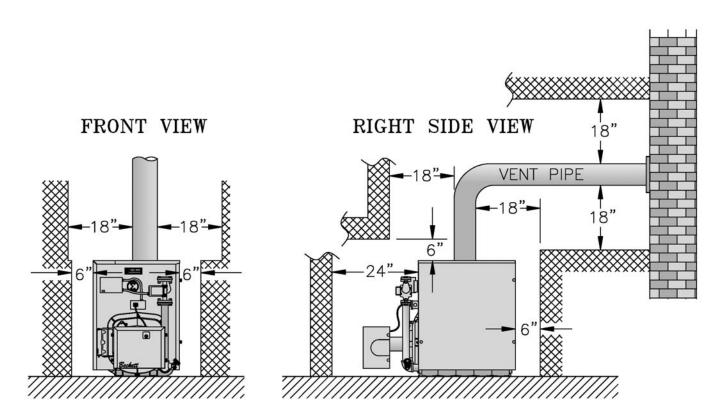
Minimum Installation Clearances To Combustible Materials (Inches)
